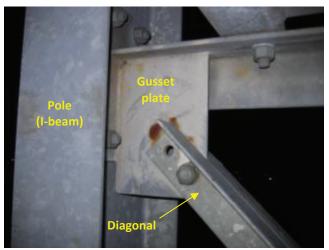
Missing bolt at diagonal member to gusset plate connection on pole (I-beam)
